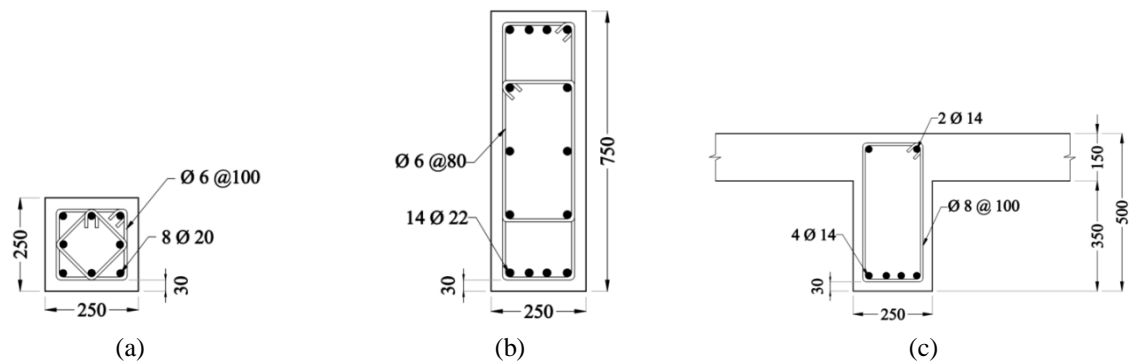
Cross-section details of Test 0.25 building (a) square column, (b) rectangular column, and (c) beam (all dimensions are in millimetres).
